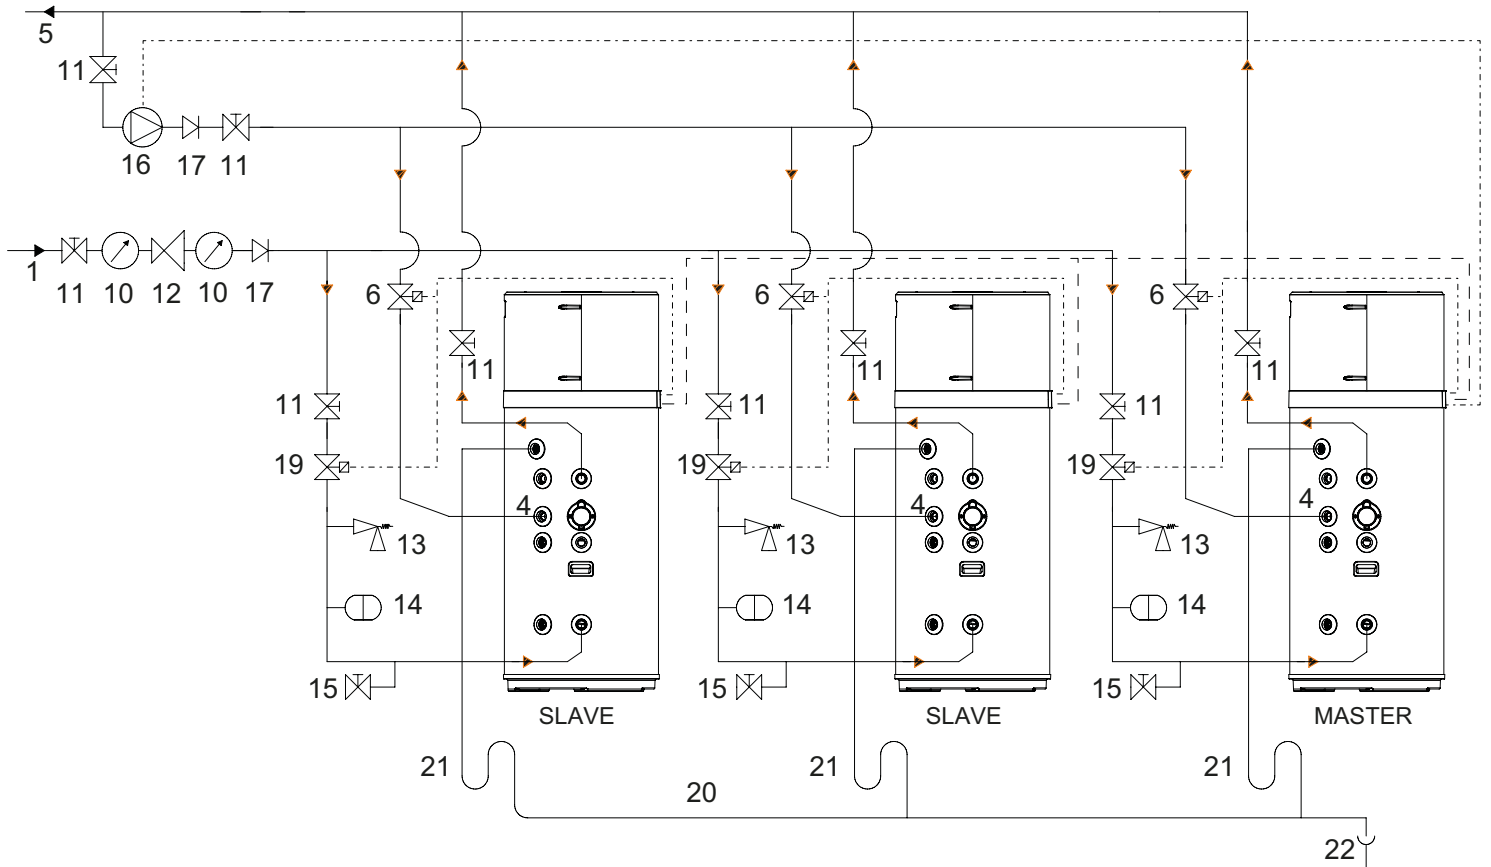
Example of water system WITHOUT thermostatic mixing valve
